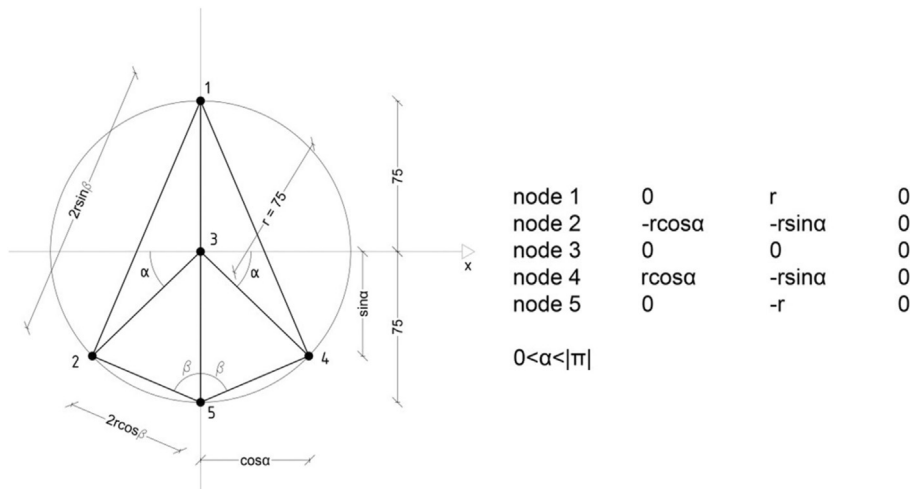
Blinking sail façade system – geometry of the elementary module.
